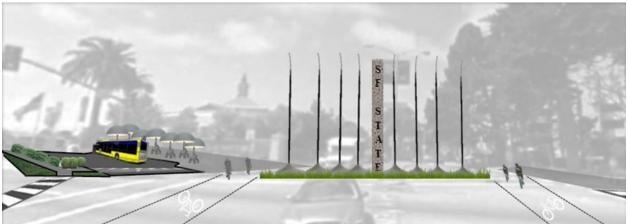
Looking west at the intersection of Holloway Avenue and 19th Avenue.
